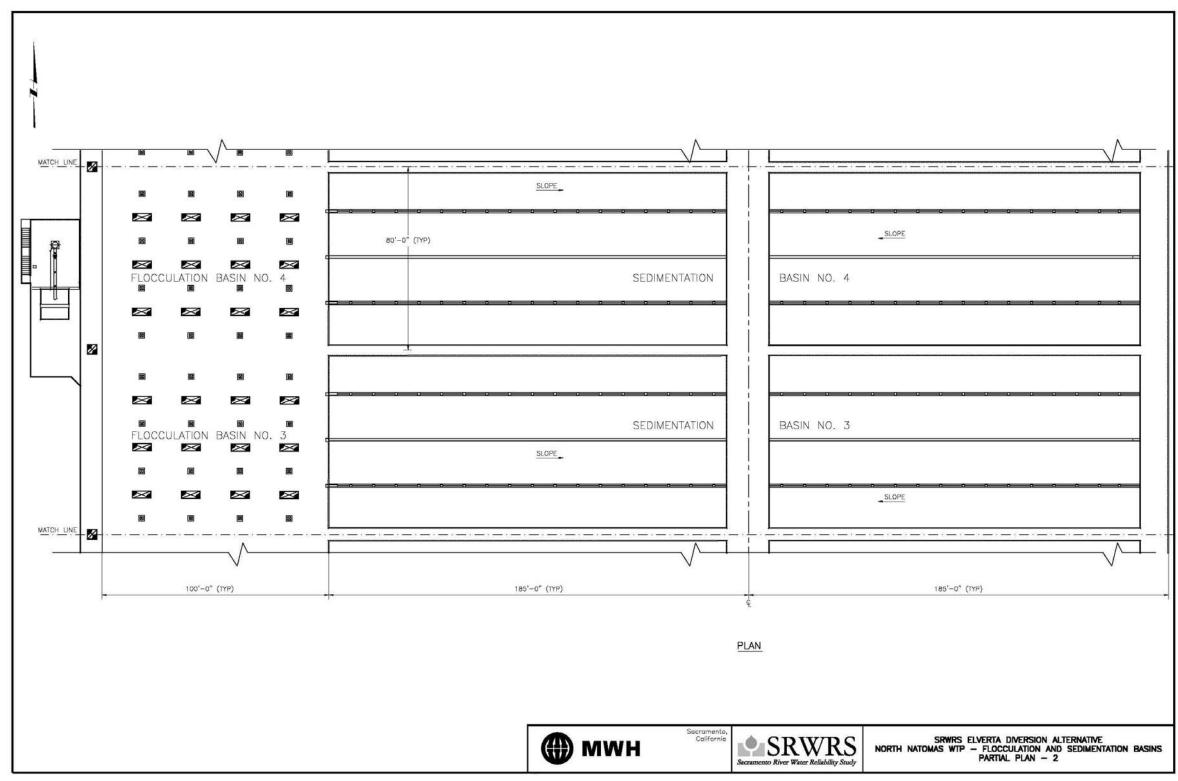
North Natomas WTP – Flocculation and Sedimentation Basins Partial Plan and Section-2
